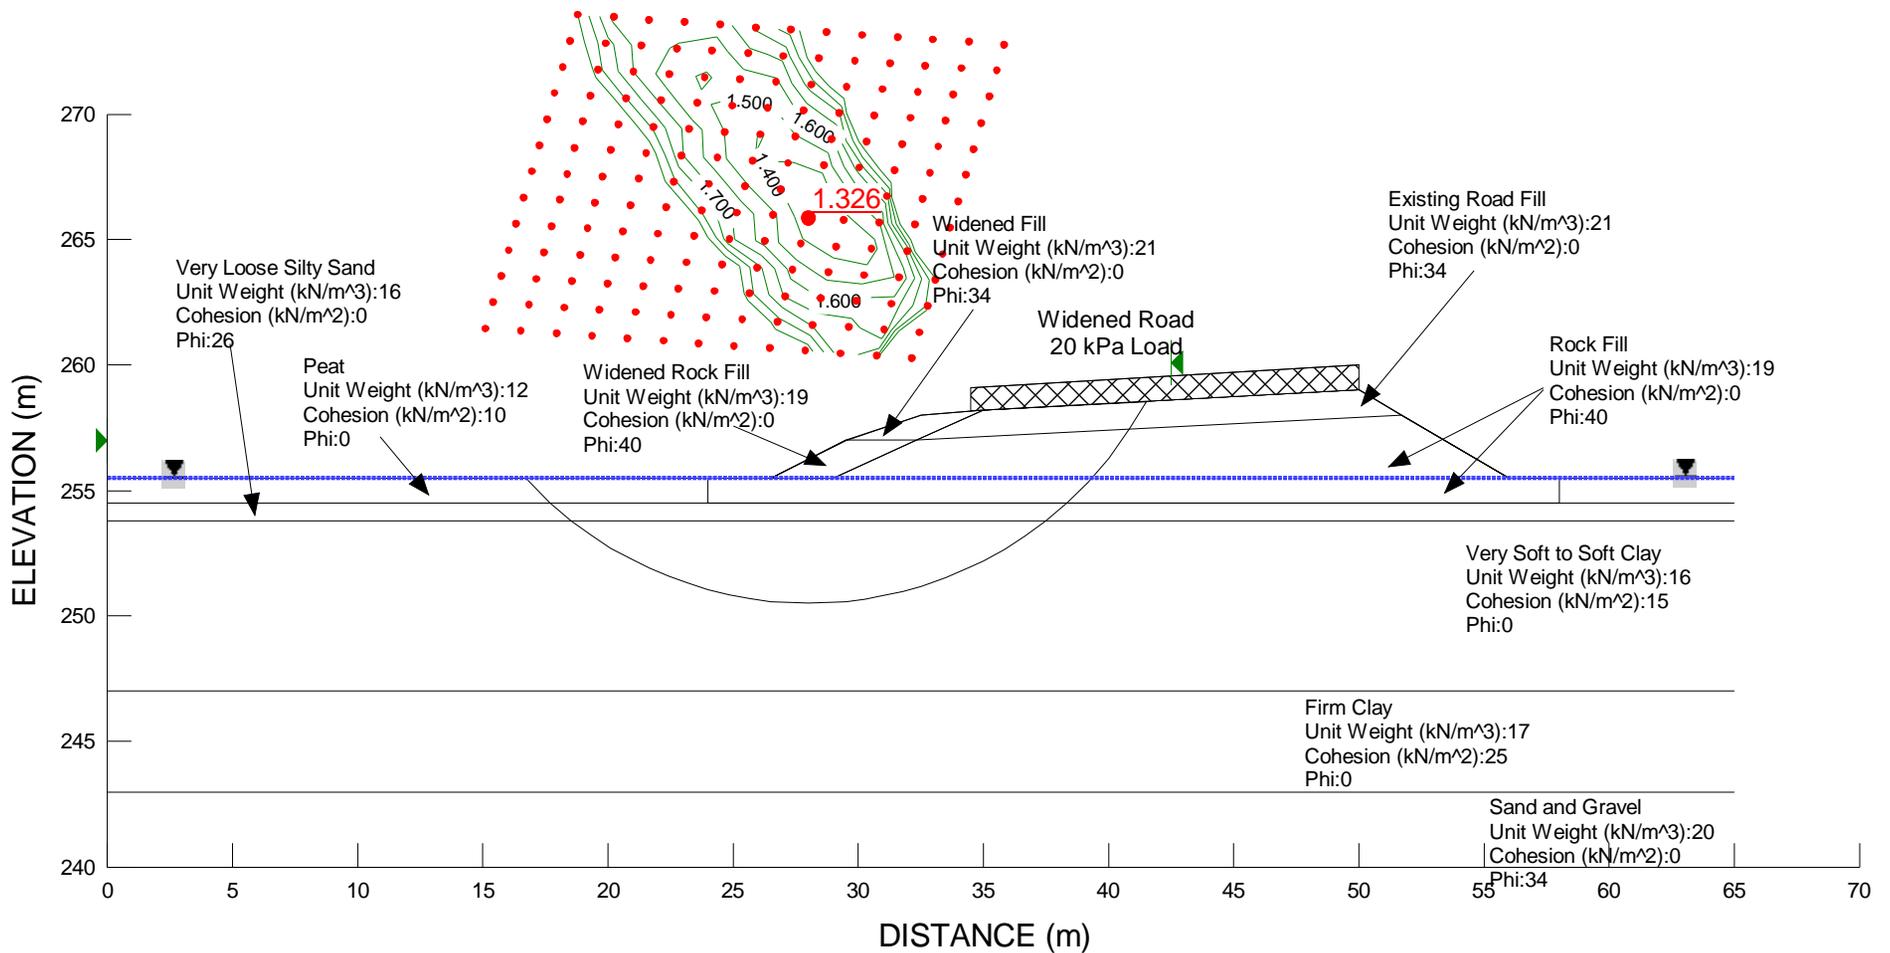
Slope Stability Analysis of Section at Station 19+100 with 2.5 m Road Widening (End of Construction - Slip Surface within Westbound Lane)
